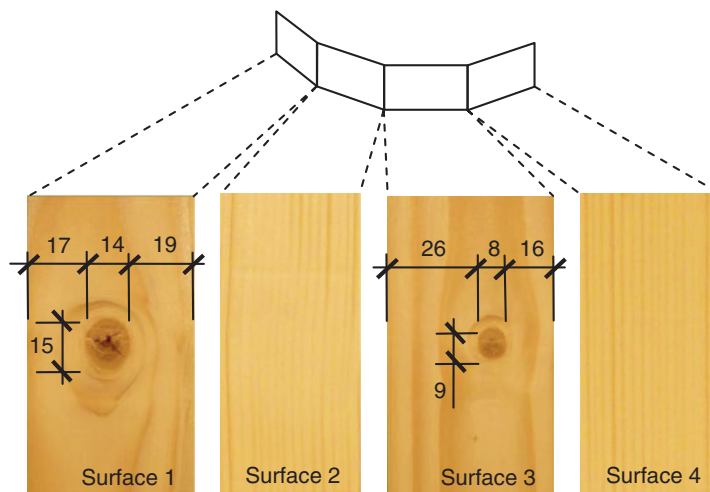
Knot dimensions (mm) in Centric knot specimen
